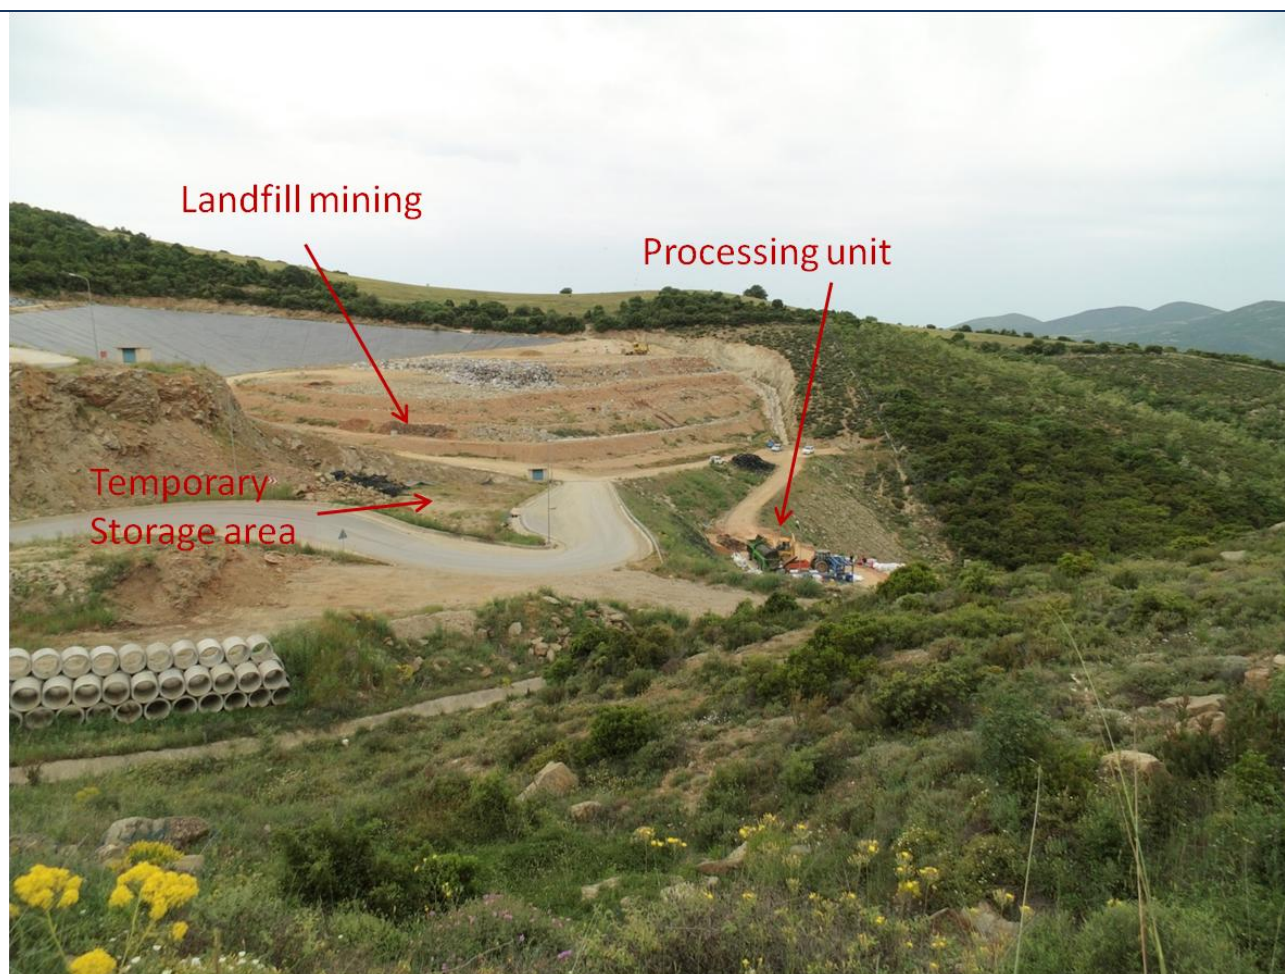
Siting of the excavation, the processing unit and the temporary storage area
